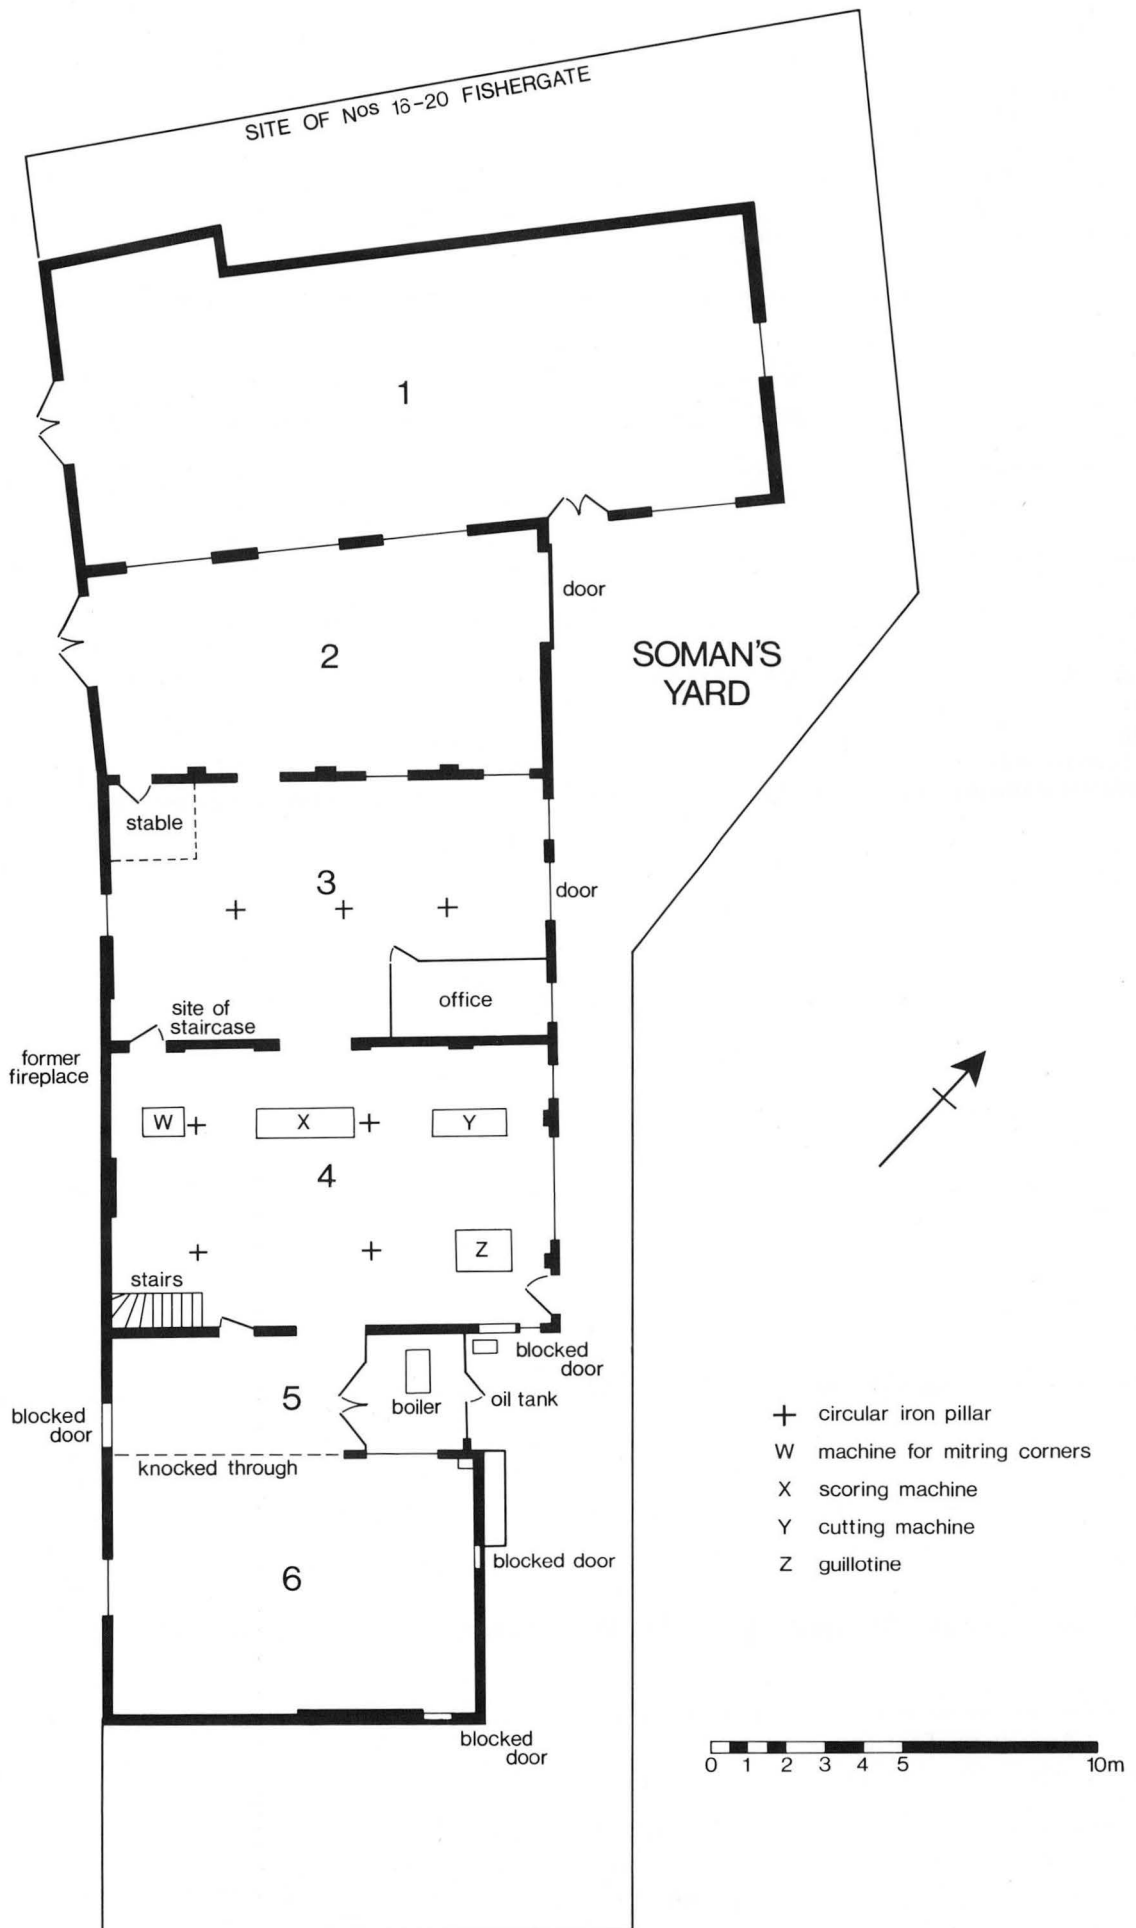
Plan of industrial buildings 1-6. Scale 1:200.
